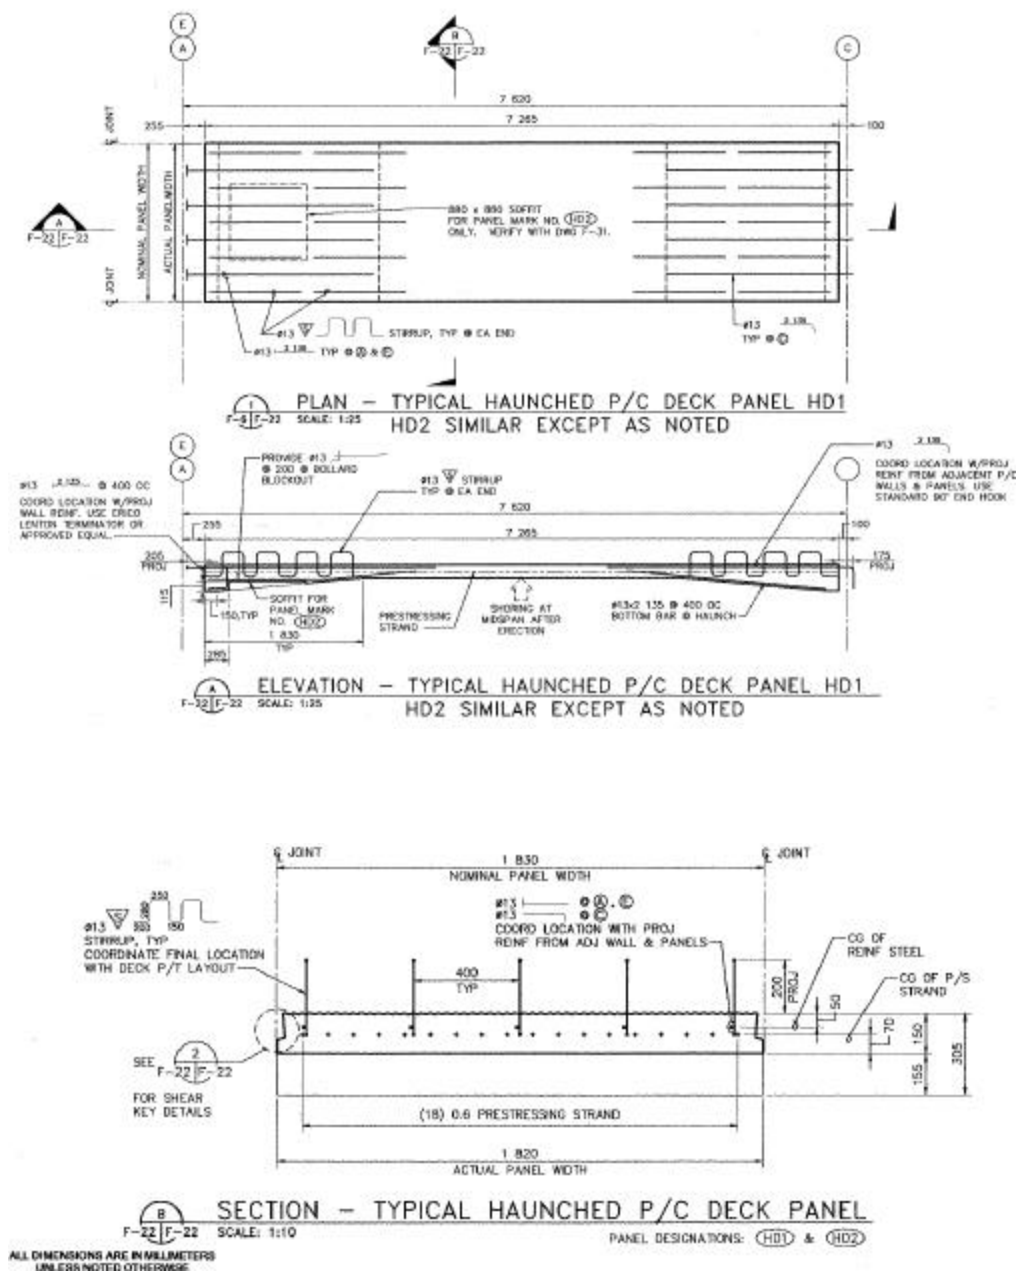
Design of Precast Prestressed Planks (in mm)
